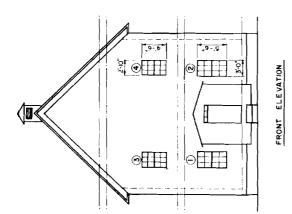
ELEVATIONS OF BUILDING No. 8 (SCHOOL)
